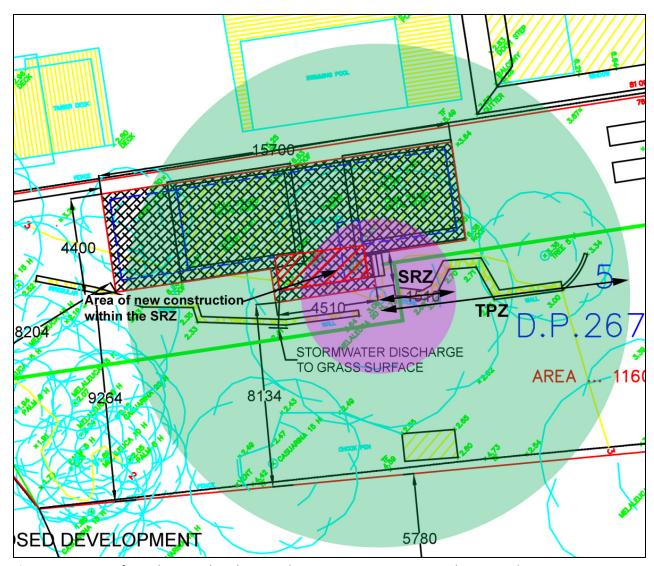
Figure A: Excerpt from the Site Plan showing the Tree Protection Zone and Structural Root Zone
